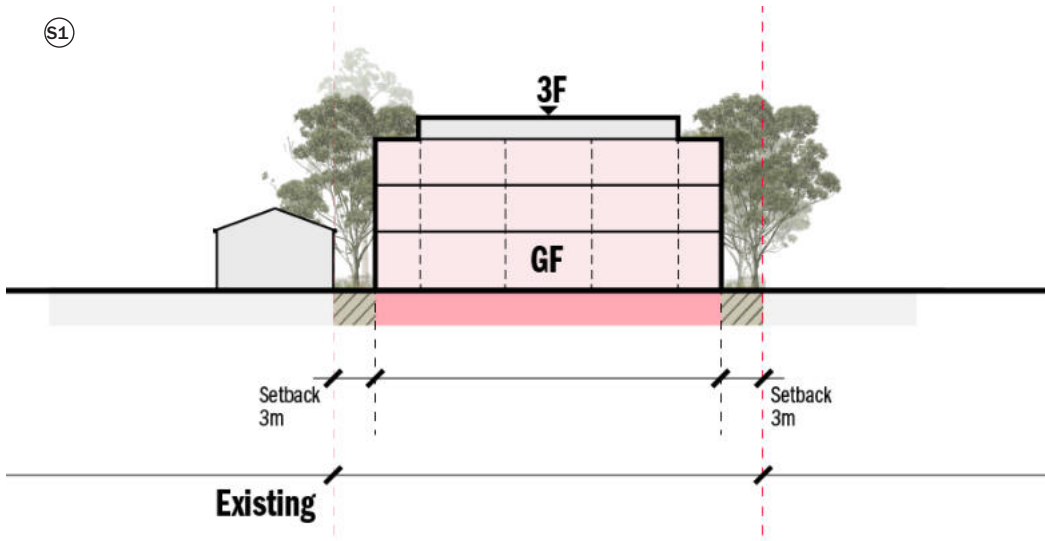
Section 1 - front elevation of a three storey residential building on Catherine Street
